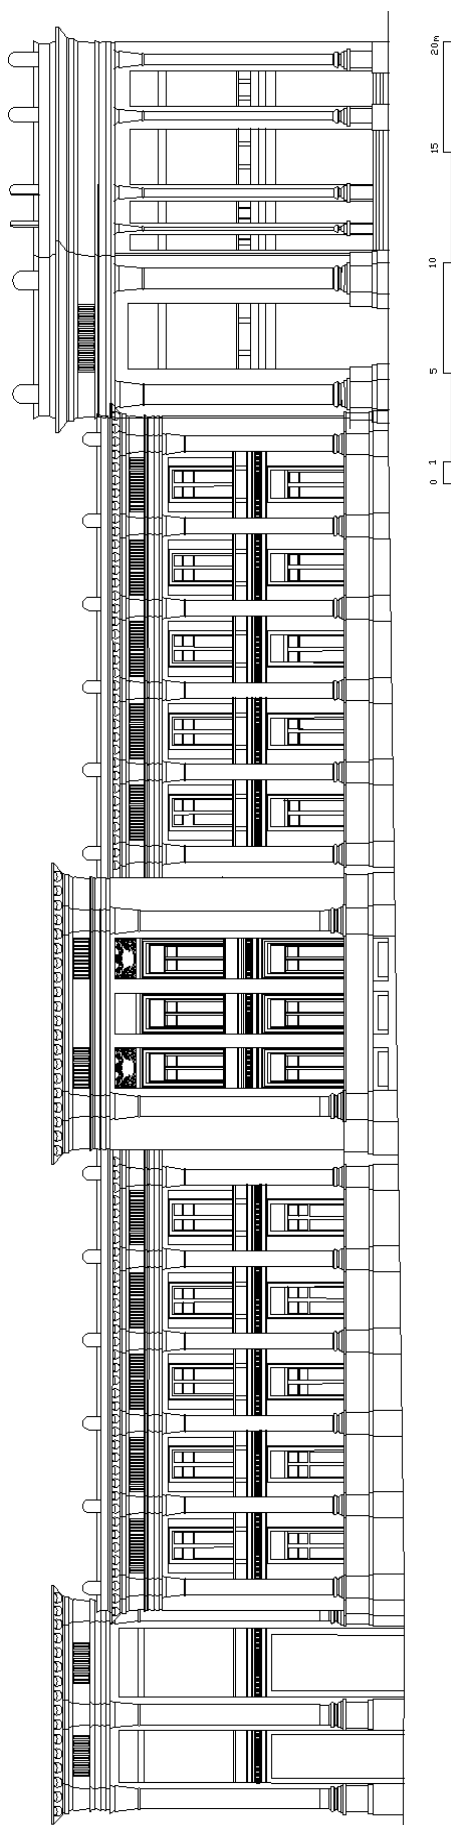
ELEVATION PLAN FROM VIA CAVOUR
